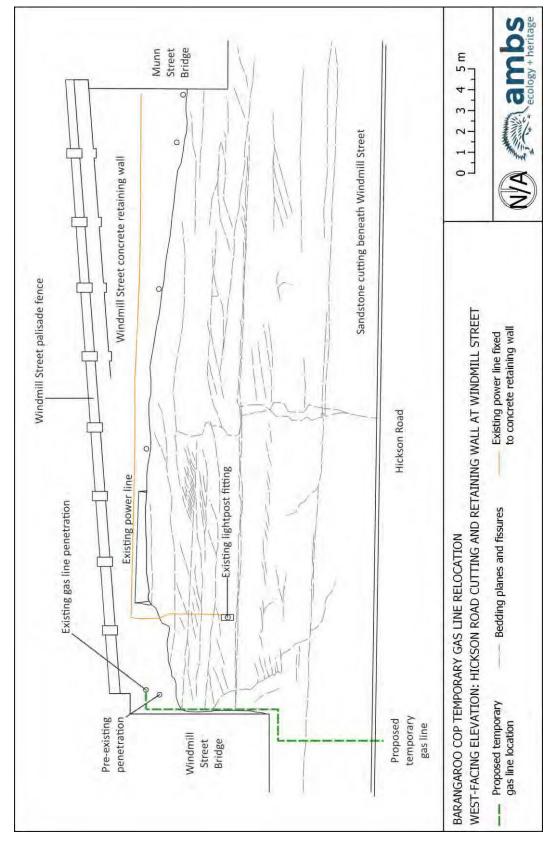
Elevation drawing of the wall between the Munn and Windmill Street bridges showing the fractures which characterise this part of the wall.
